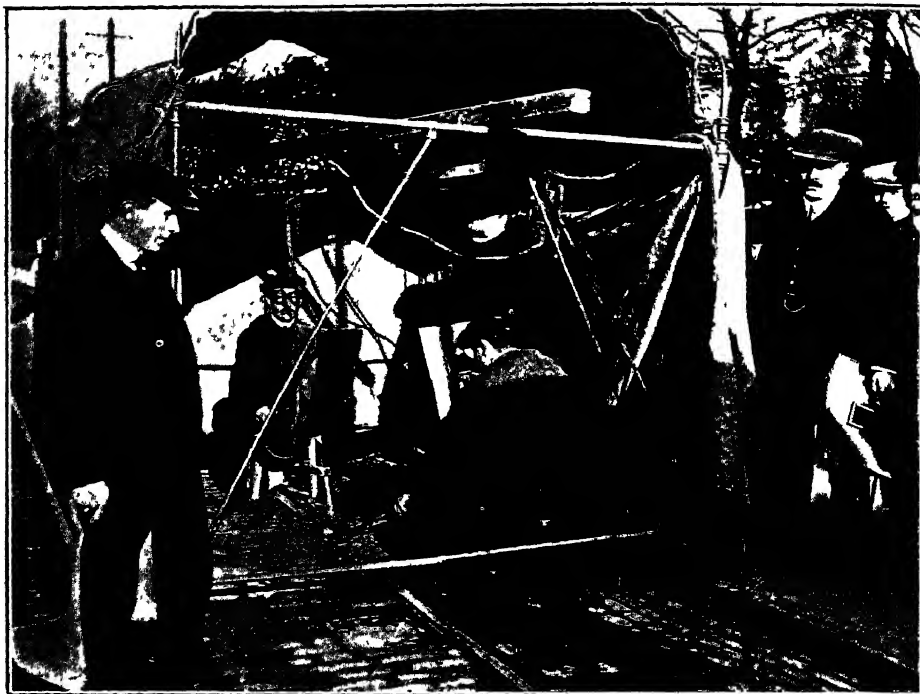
Interior of "Tudor" welding hut.
